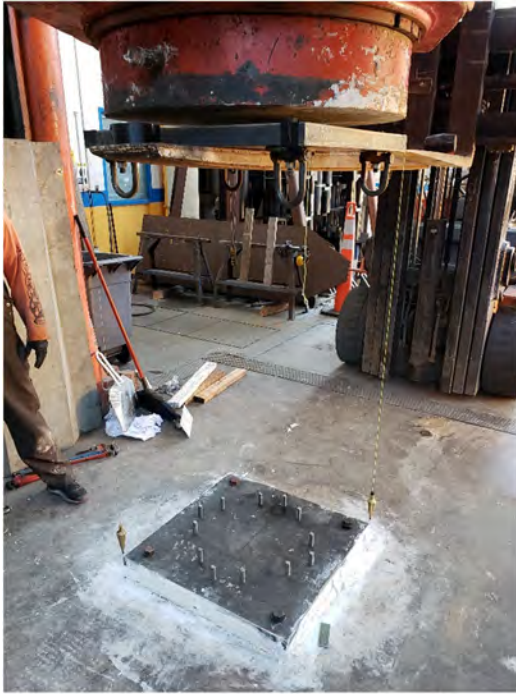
PEER UC Berkeley 4000-kip loading machine.
